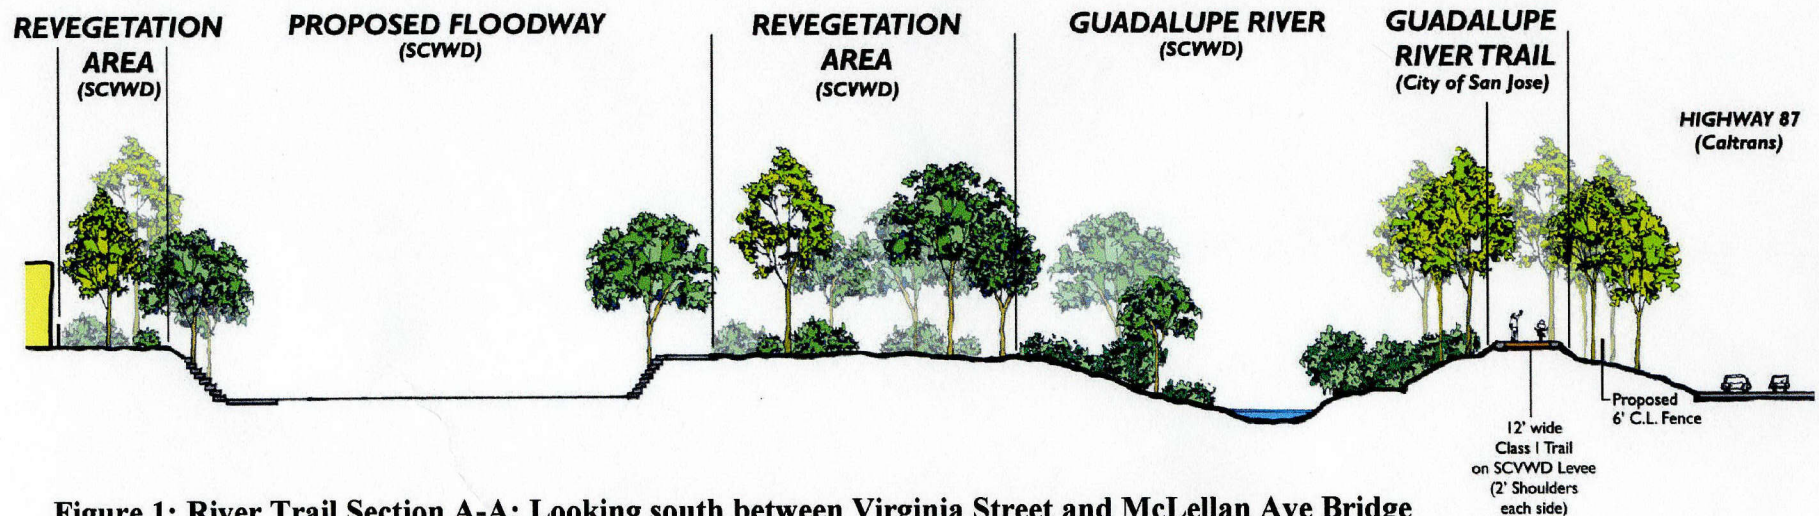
River Trail Section A-A: Looking south between Virginia Street and McLellan Ave Bridge
